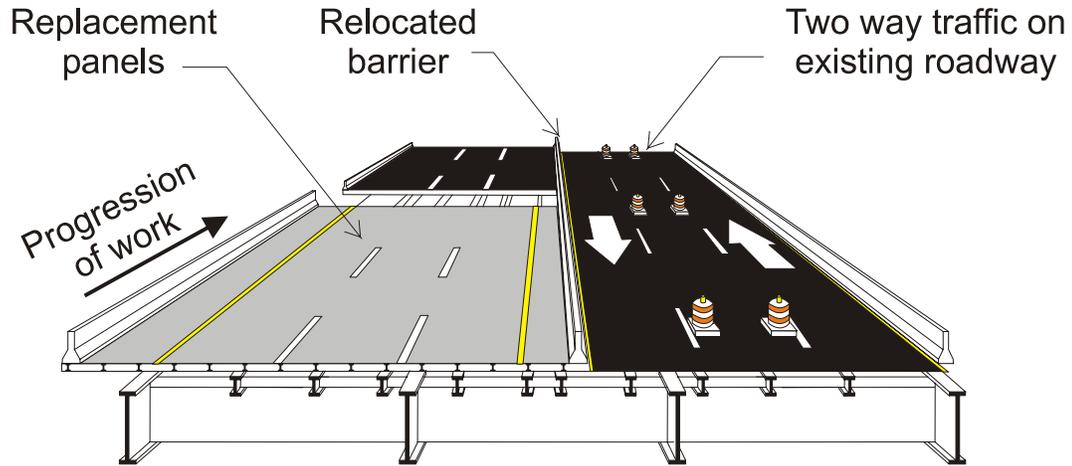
Installation of new panel of bridges at Route 7 over Route 50, Fairfax, Virginia. [Source: Babaei et al. (1).]
